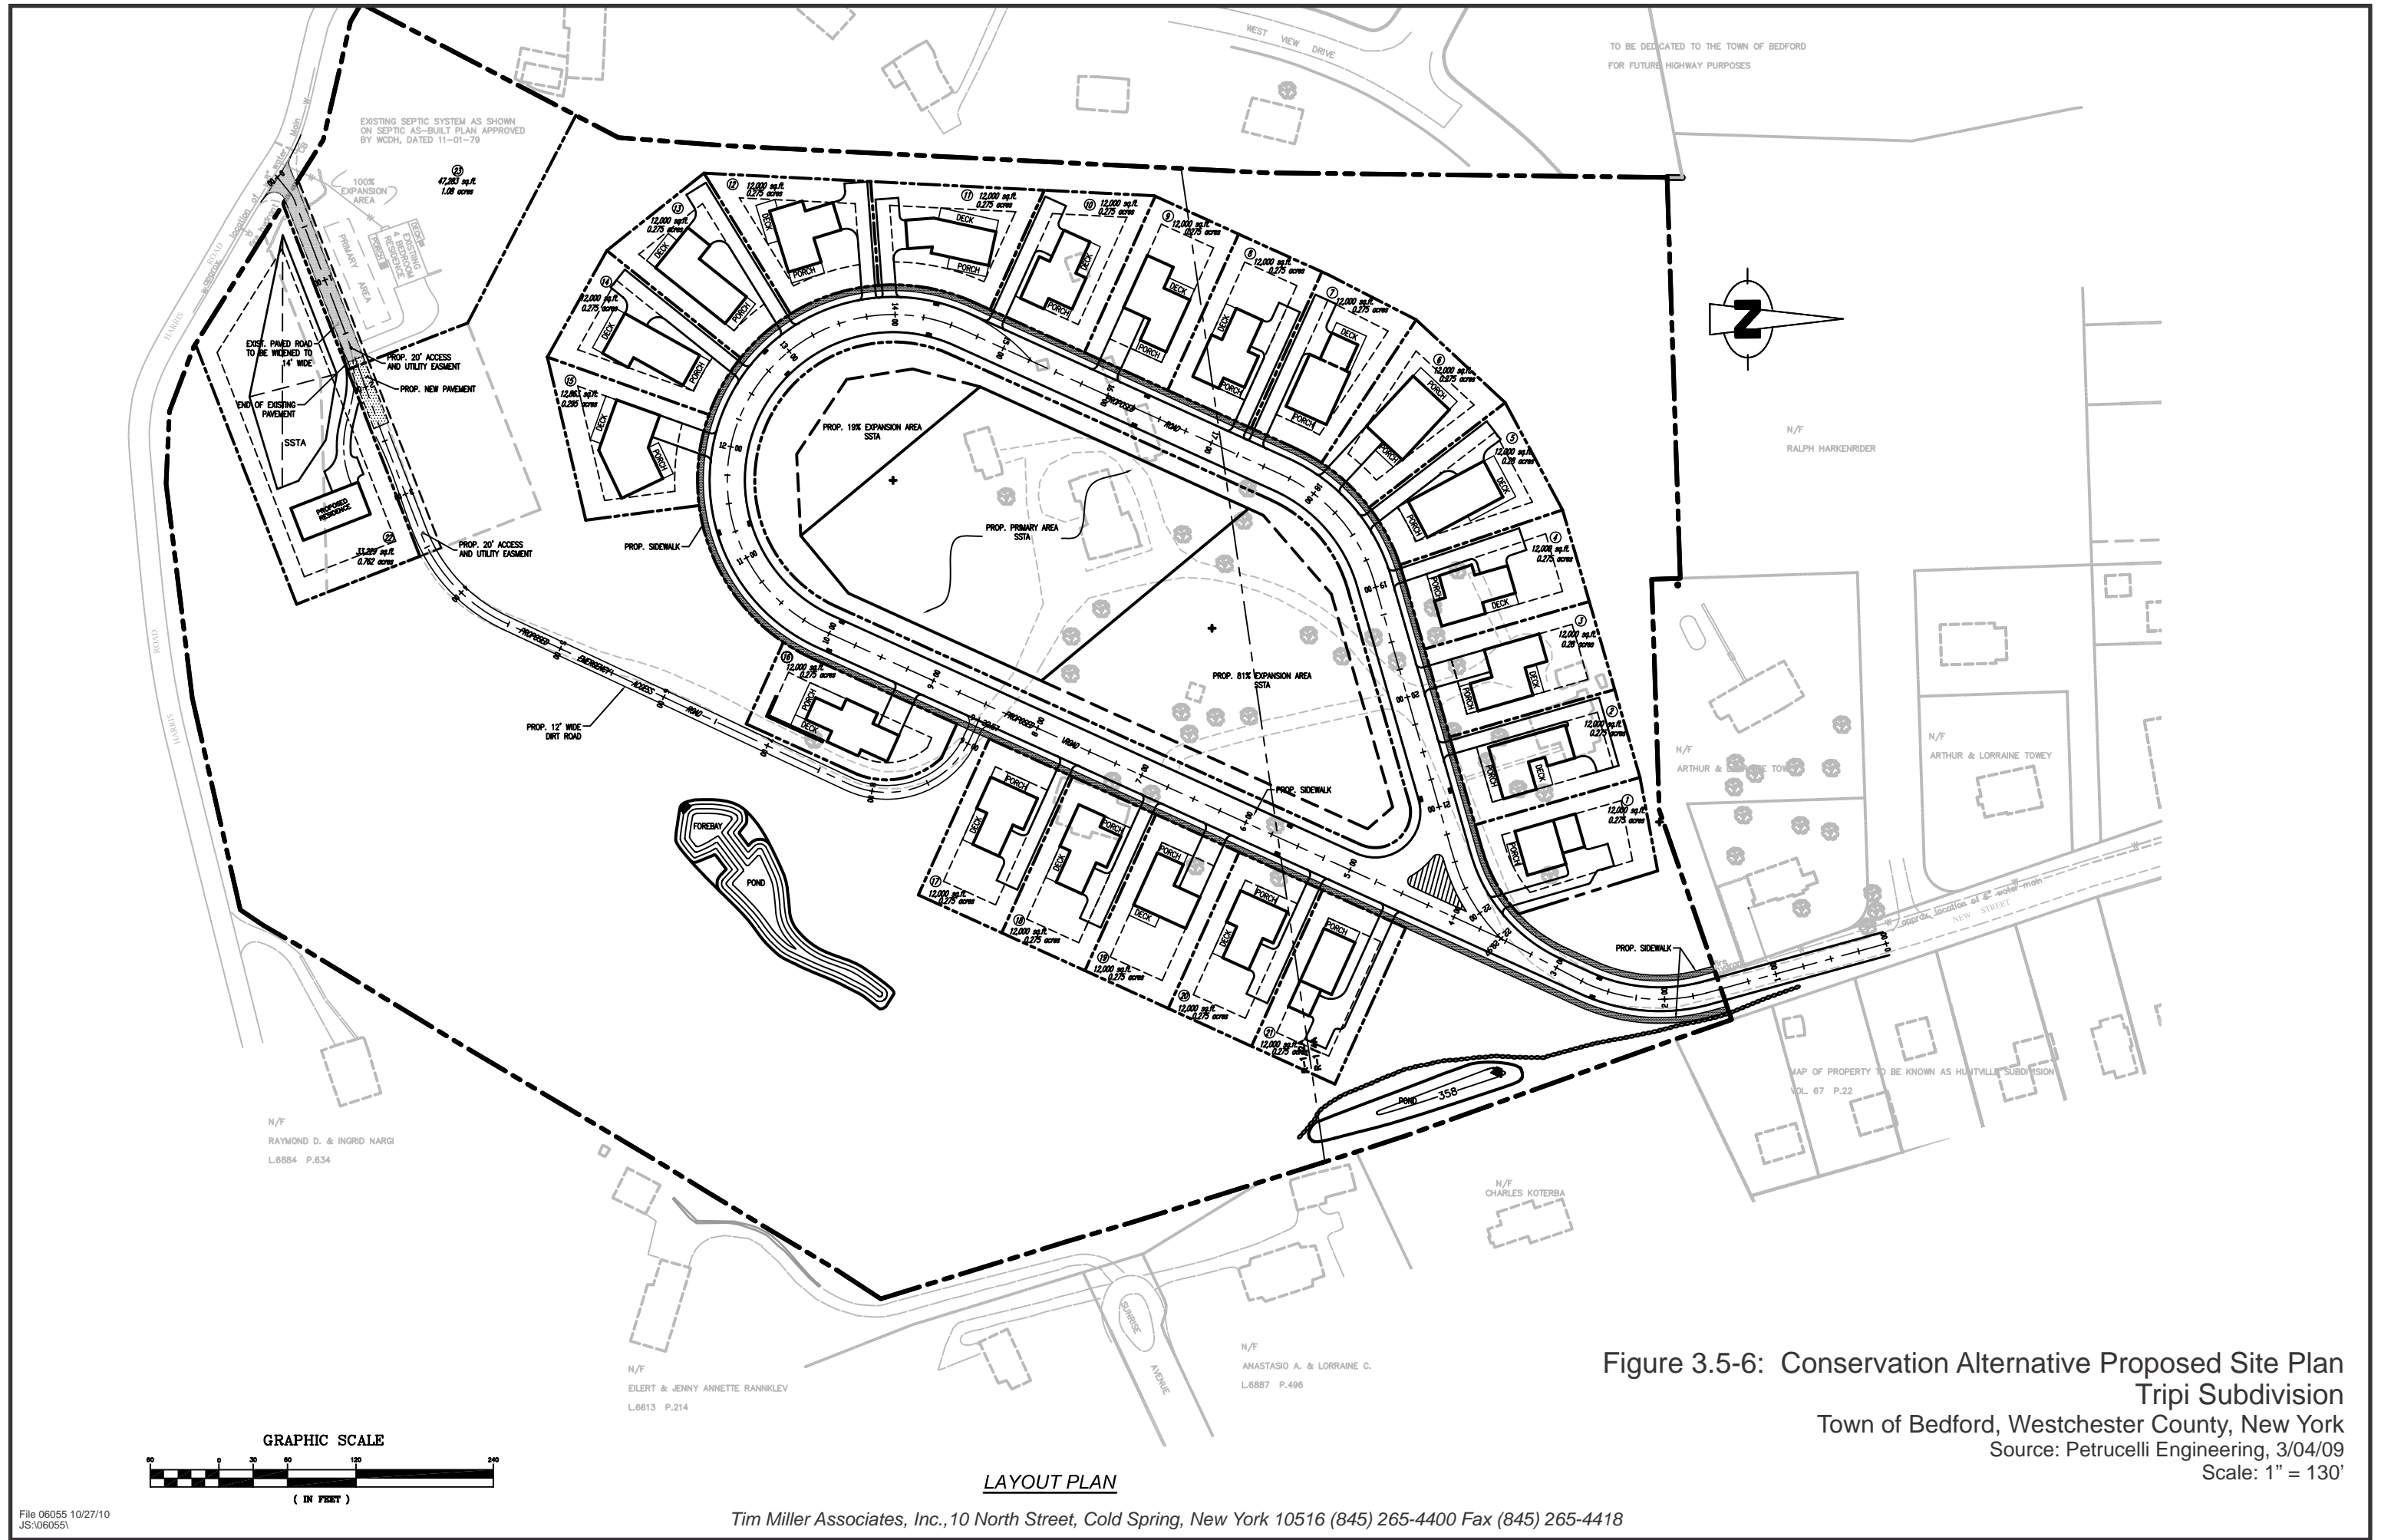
Conservation Alternative Proposed Site Plan
